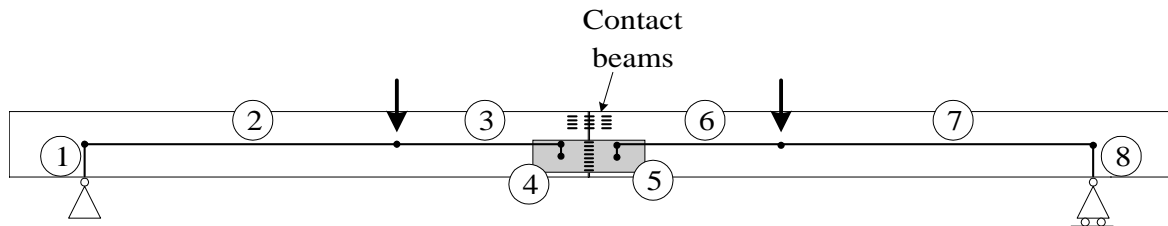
TRUSSLAB model for test series BE4. Element numbers for the timber beam elements are shown in a circle.
